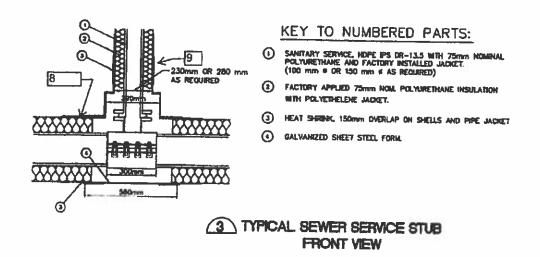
Detail 3 - from drawing C-332 - Sewer service connection kit at main - Front view
